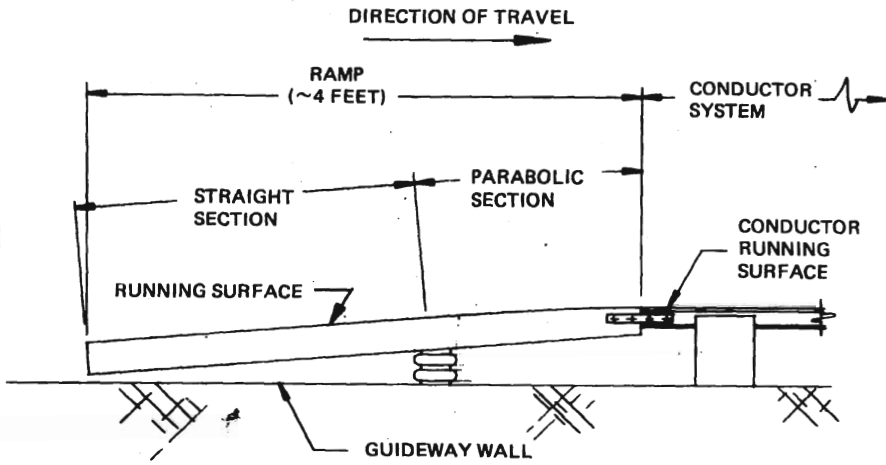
AIRTRANS APPROACH RAMP (PLAN VIEW)
